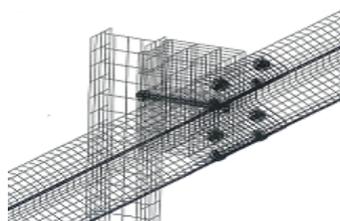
FE Model of w-beams Connected to Post and Blockouts
